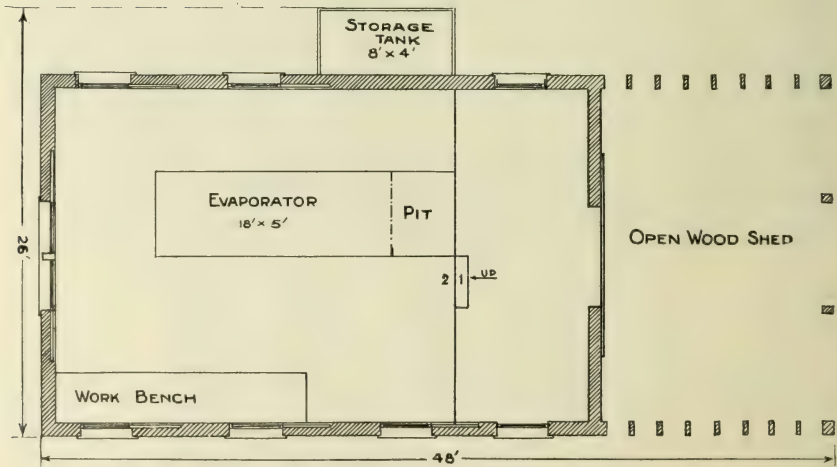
FLOOR PLAN OF SUGAR HOUSE
